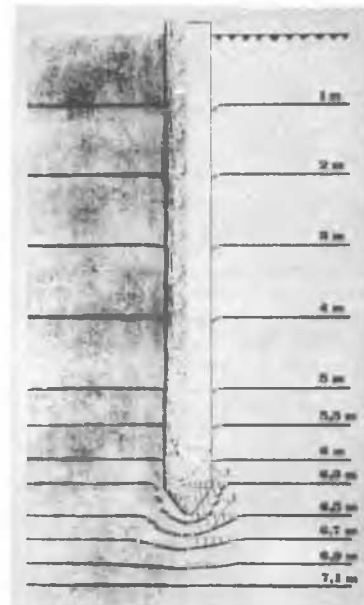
Cross-section of pile after test with indicator lines that show the deformation of the soil around the pile: 1-before static load test; 2-after static load test.
